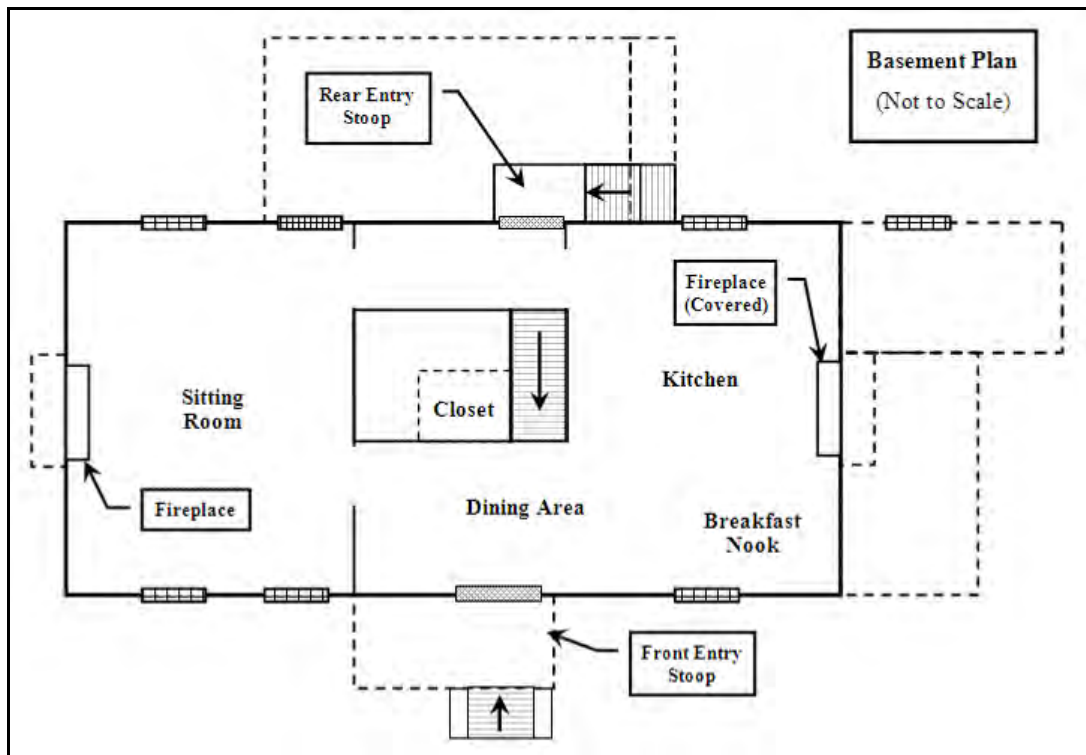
Basement-Level Interior Plan of Cedar Knoll Main House.
